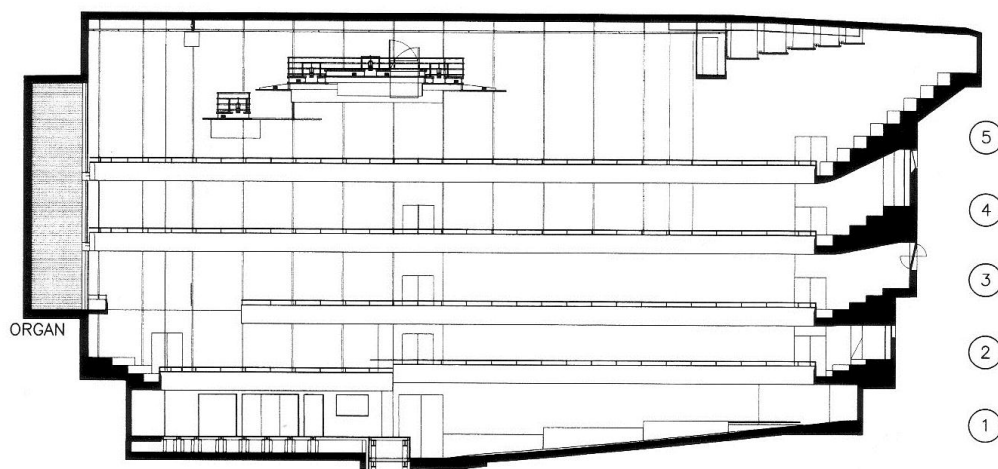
Switzerland, Lucerne, culture & congress centre concert hall, plan and section II
